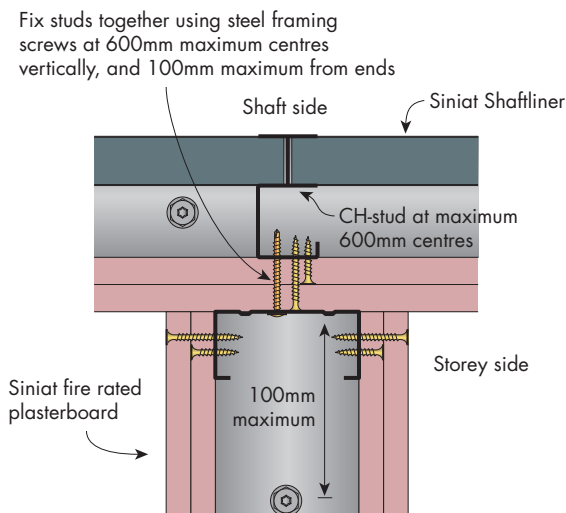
Shaft Wall to Internal Partition Corner
